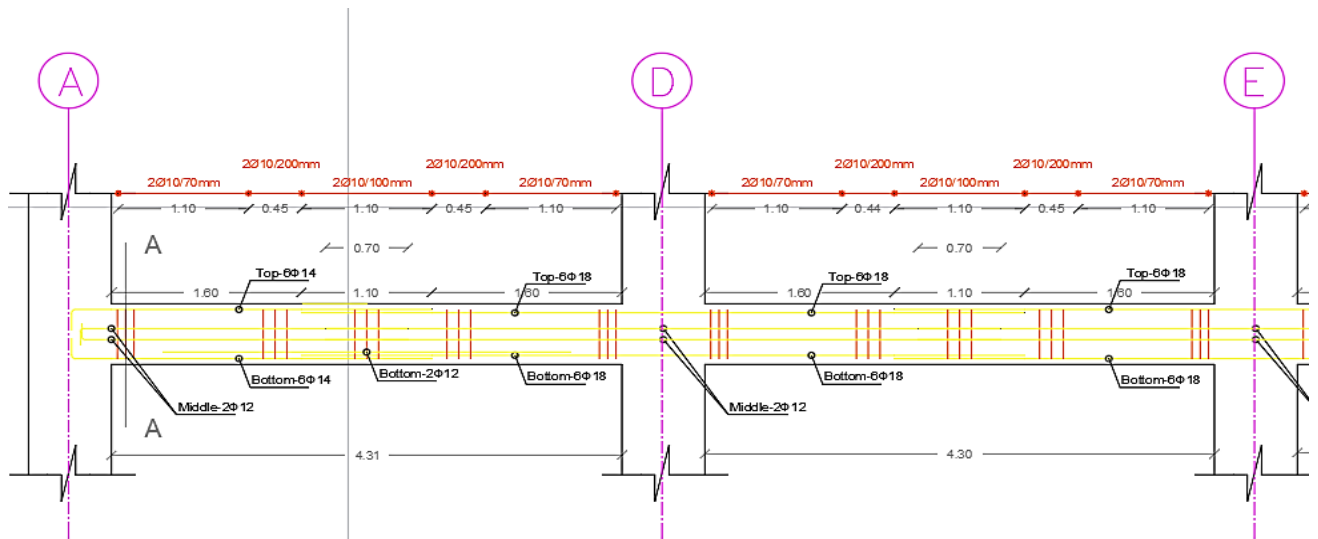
Beams detailing after adding the diaphragm steel.
